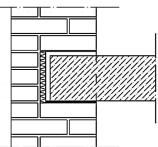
Typical wall – floor connection (built 1860's+1920's) [14]. Floor bearing beams are just positioned on the edge of the wall without any proper bonding elements to connect floors and walls
